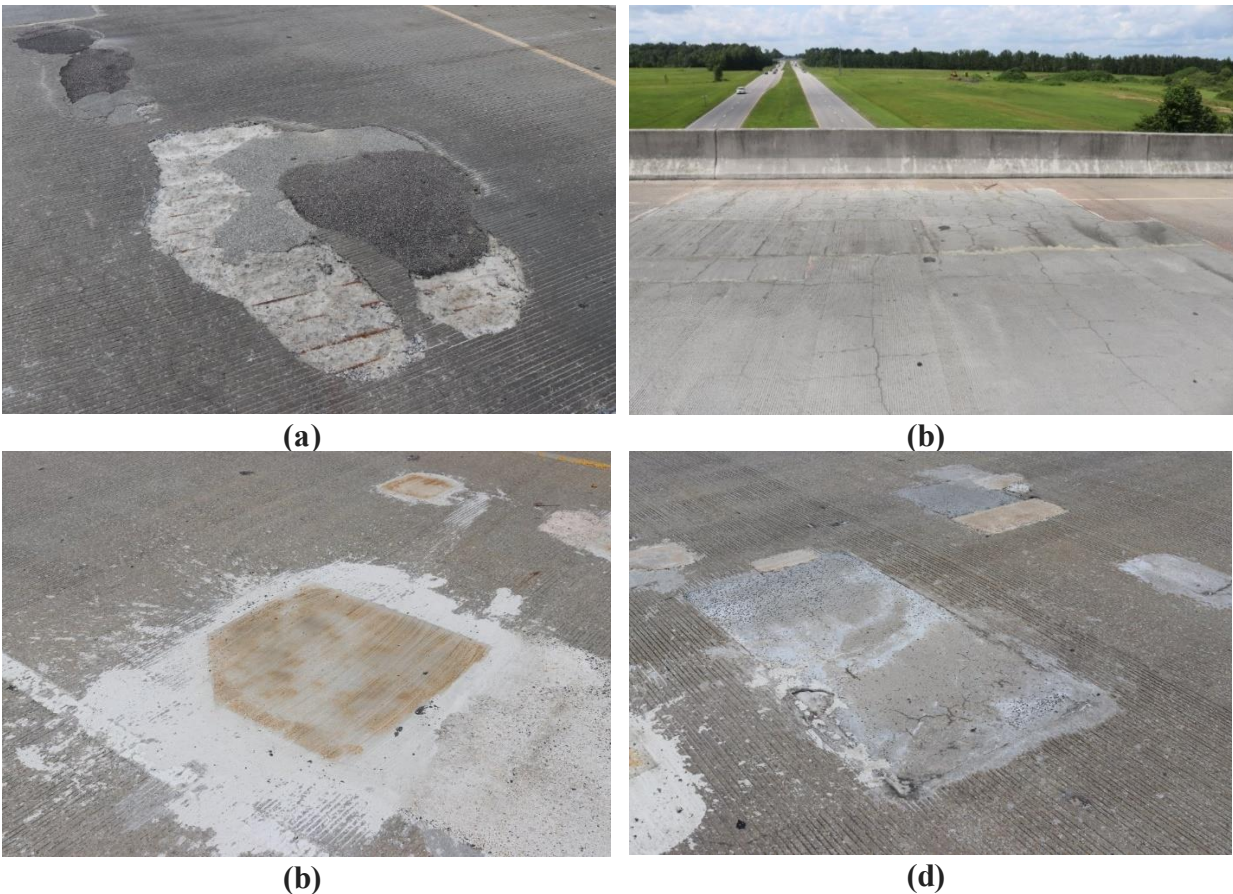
(a) Patched Pavement Section with Corrosion (b) Alligator Cracking along Patched Area (c) Patched Section with Corrosion Staining (d) Uneven and Cracked Patch
